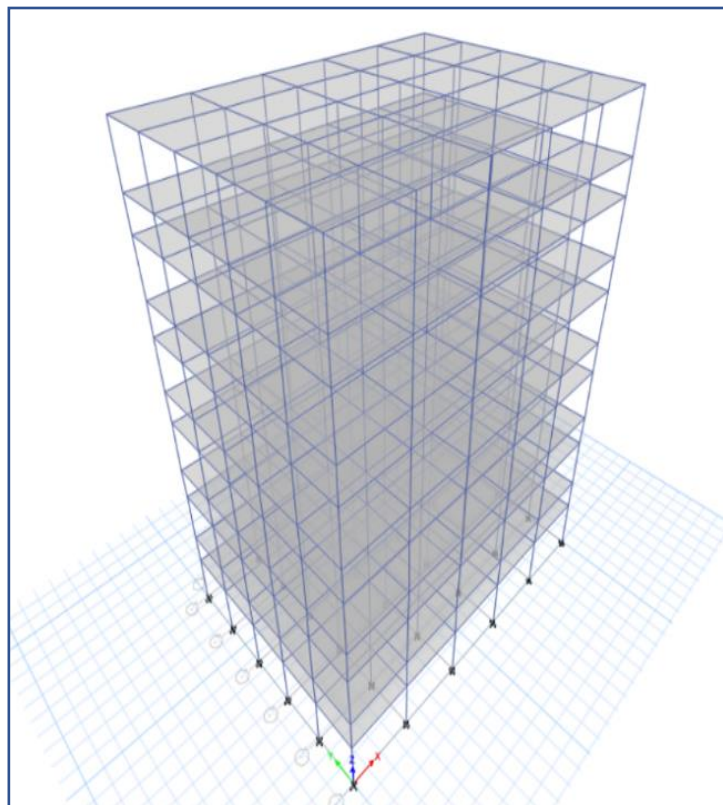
Typical 3D plan of G+10 RC Flat Surface Building.
